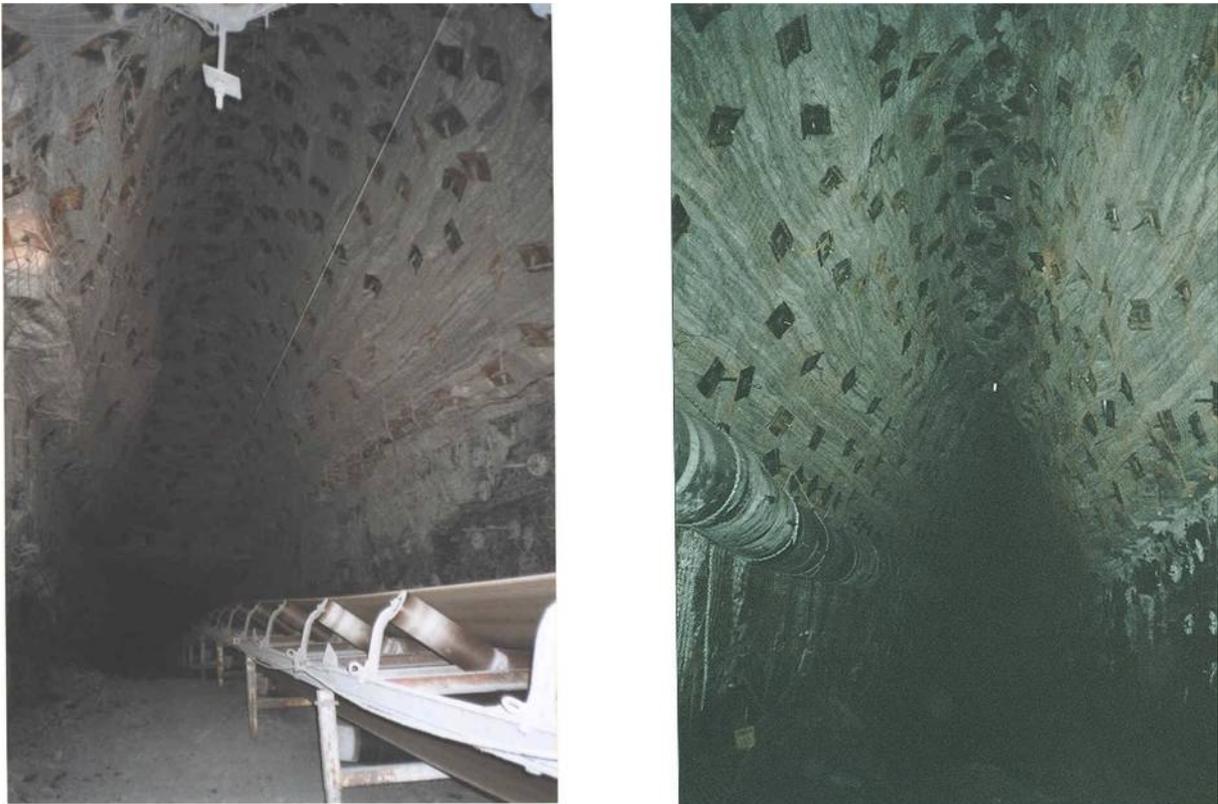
Standard triangular shape of roadway roof fall cavities at Crinum
